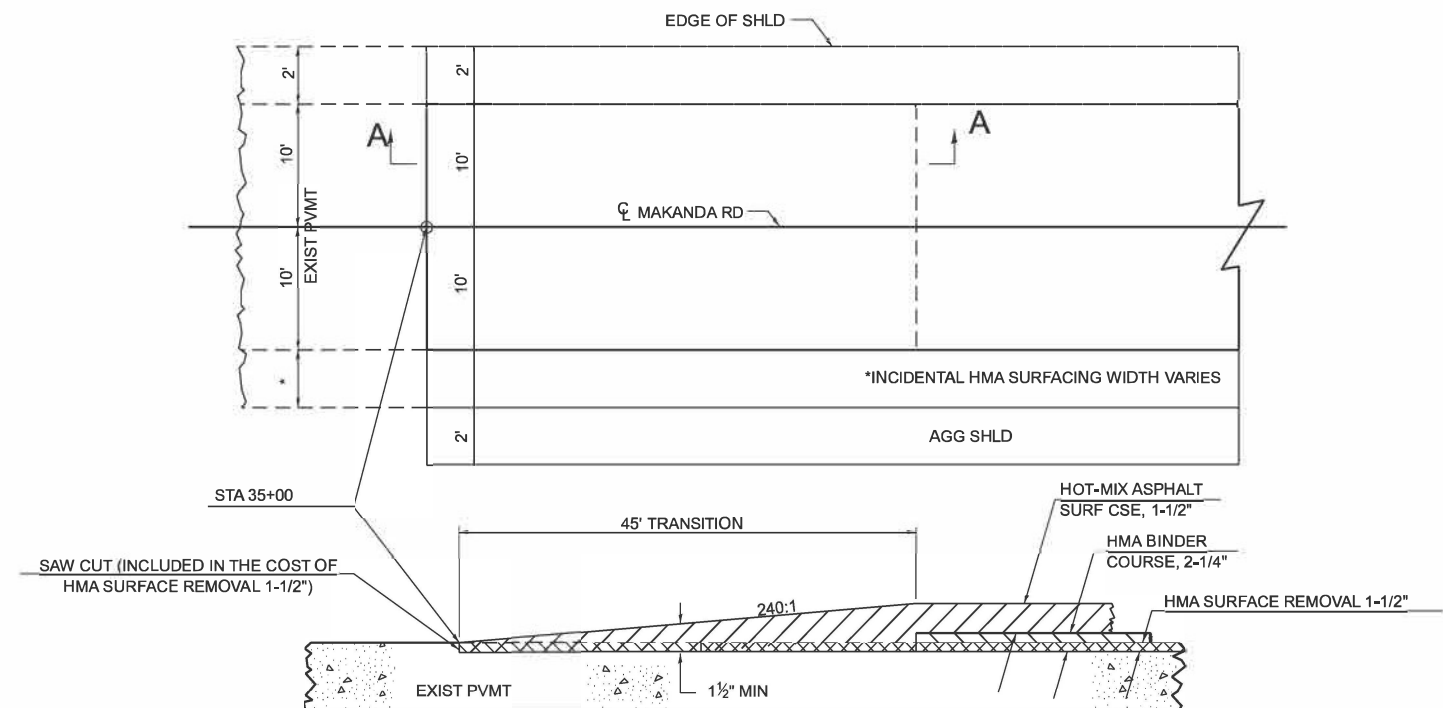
DETAIL OF BITUMINOUS OR PCC SIDEROADS WITH BUTT JOINT
